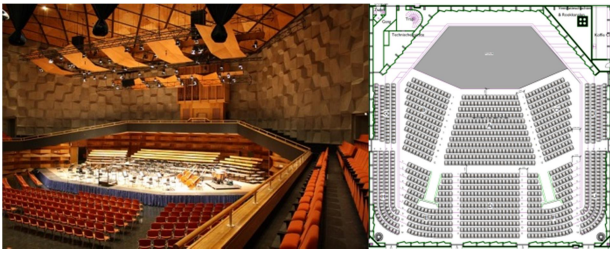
Oosterpoort Groningen, before renovation. Right; floor plan
